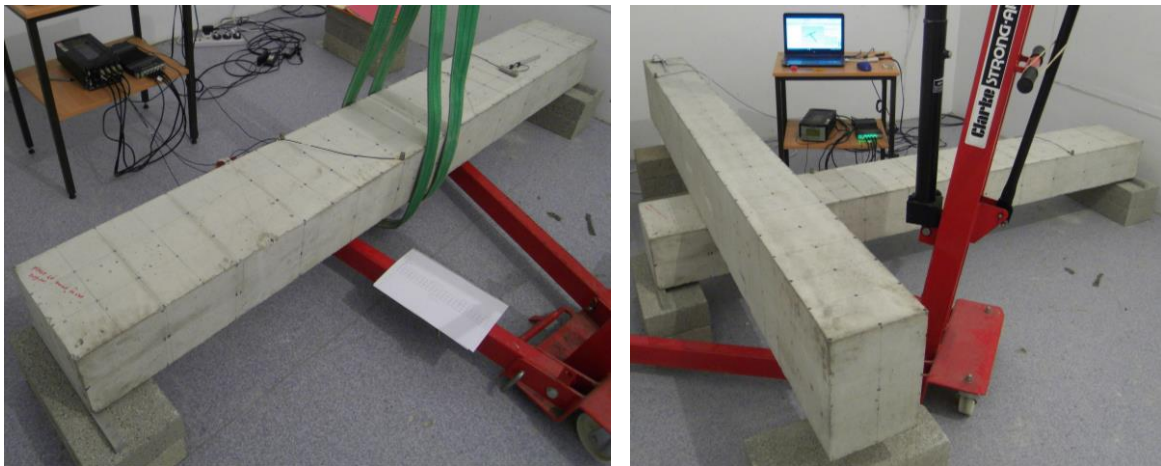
(Left) Test setup 1 showing the transducers and the aluminium sections that approximate the simply support condition for the beam 1, (Right) Test setup 3 showing the test equipment and the junction formed by beams 1 and 2
